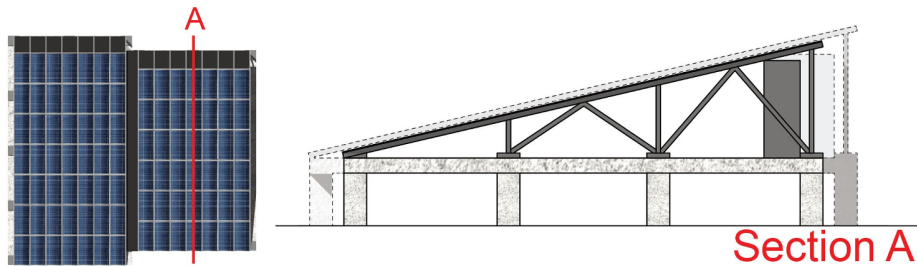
BIPV/T Plan view (left) and section through the system, framing and building structure (right)
